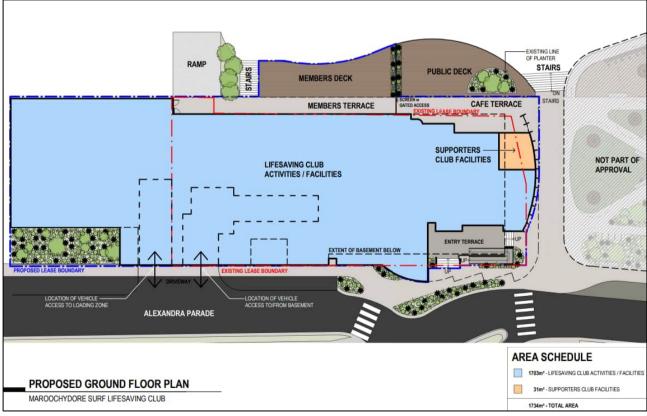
Ground Floor Plan of Proposed Surf Club Redevelopment
